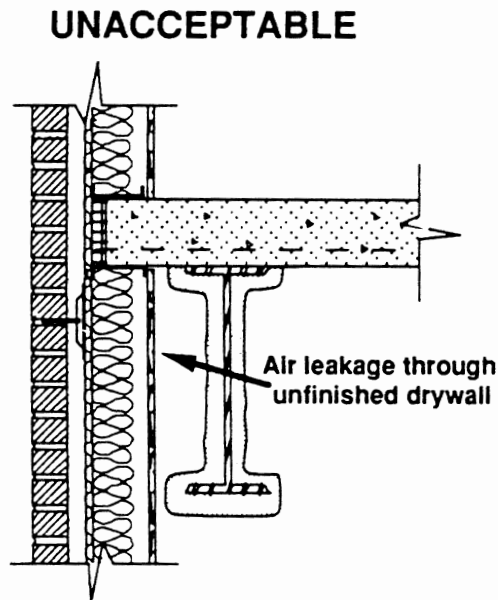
Failure of Air Barrier Continuity (Kudder)
